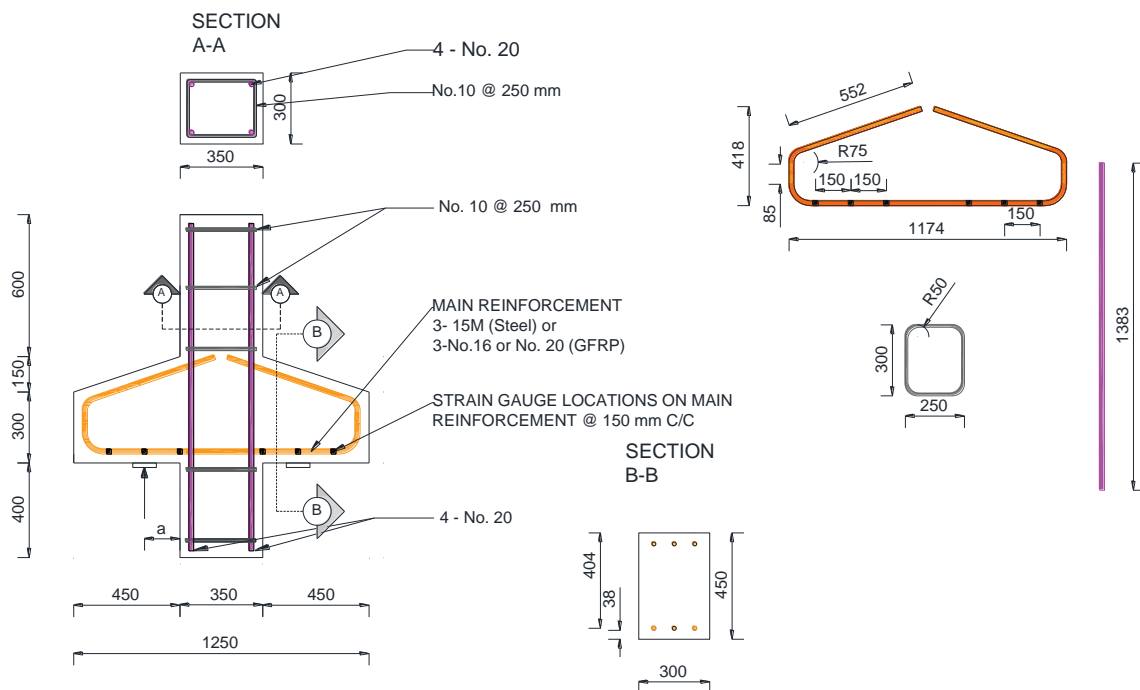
Geometry and Reinforcement details for corbels without crack-control reinforcement.
